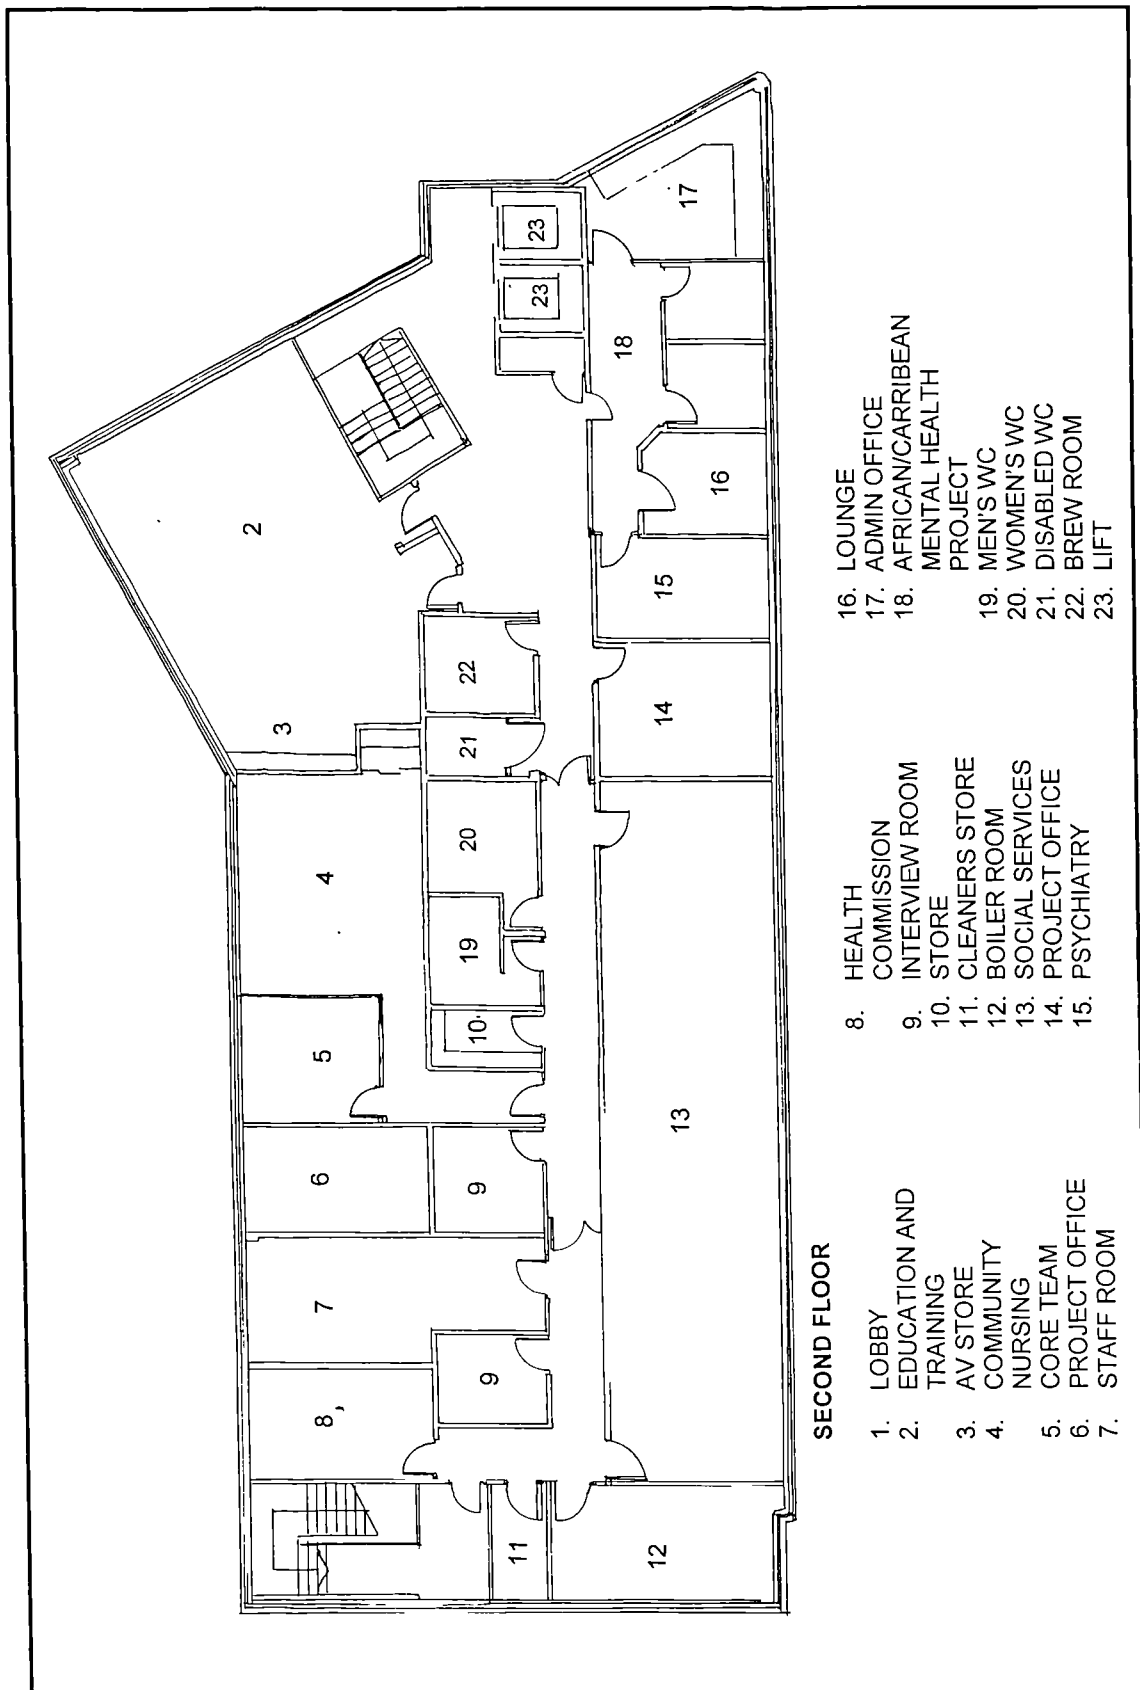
Kath Locke: Second Floor Plan Architects: Snapes Design and Build
